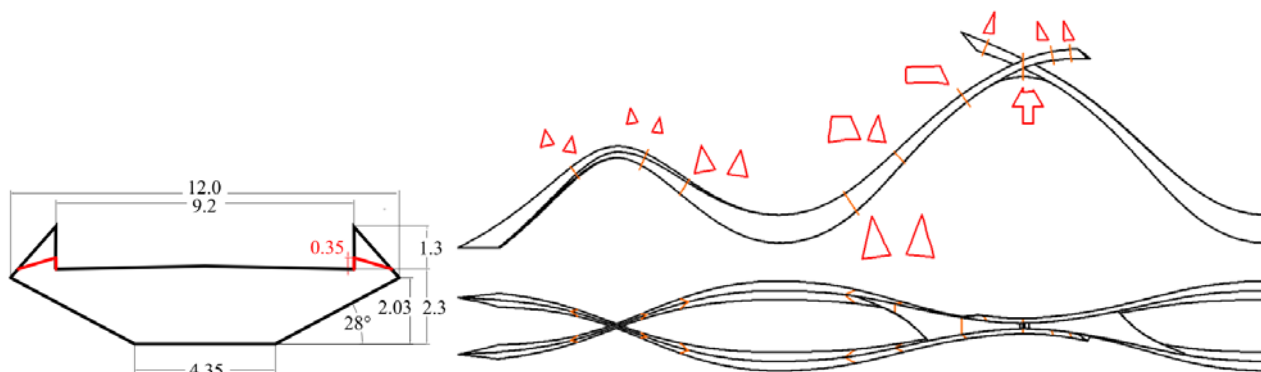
On the left, Original and Tailored deck cross section (in red); on the right, detail of the arches with some cross sections.
